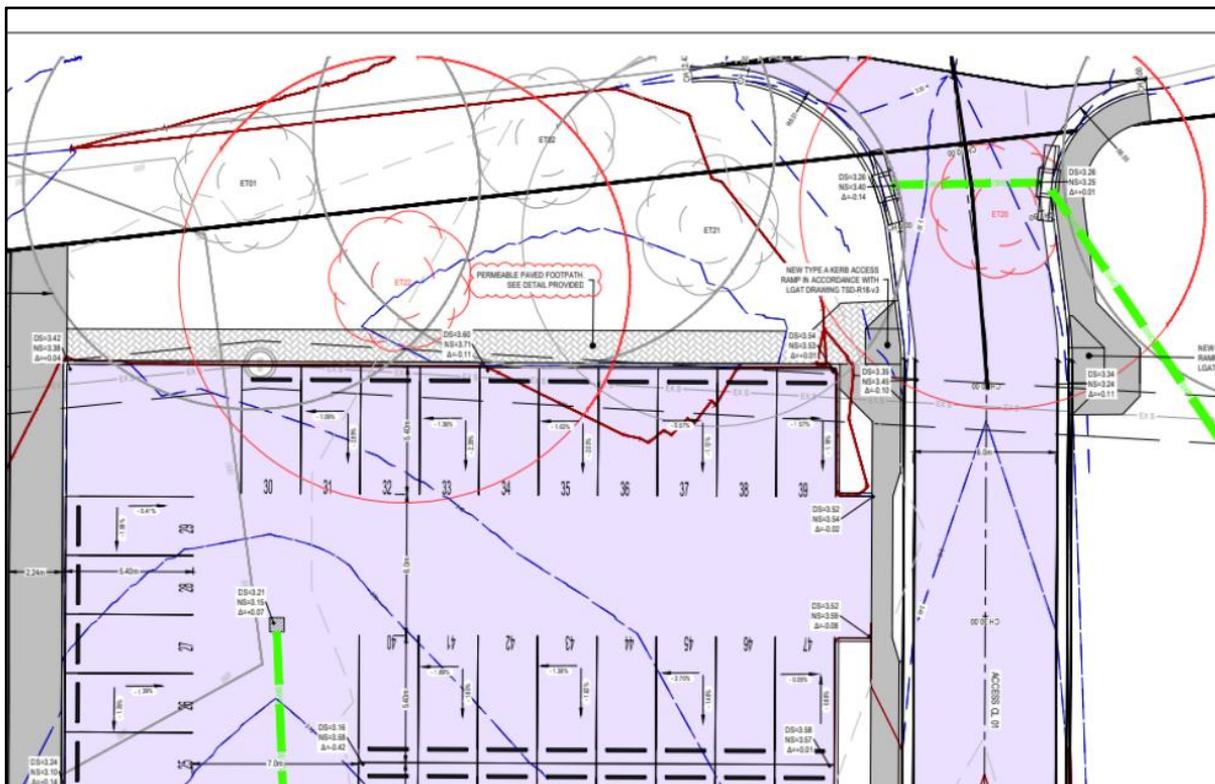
Plans for crossover into site. Tree 20 within driveway. (Source Aldanmark consulting engineers).
